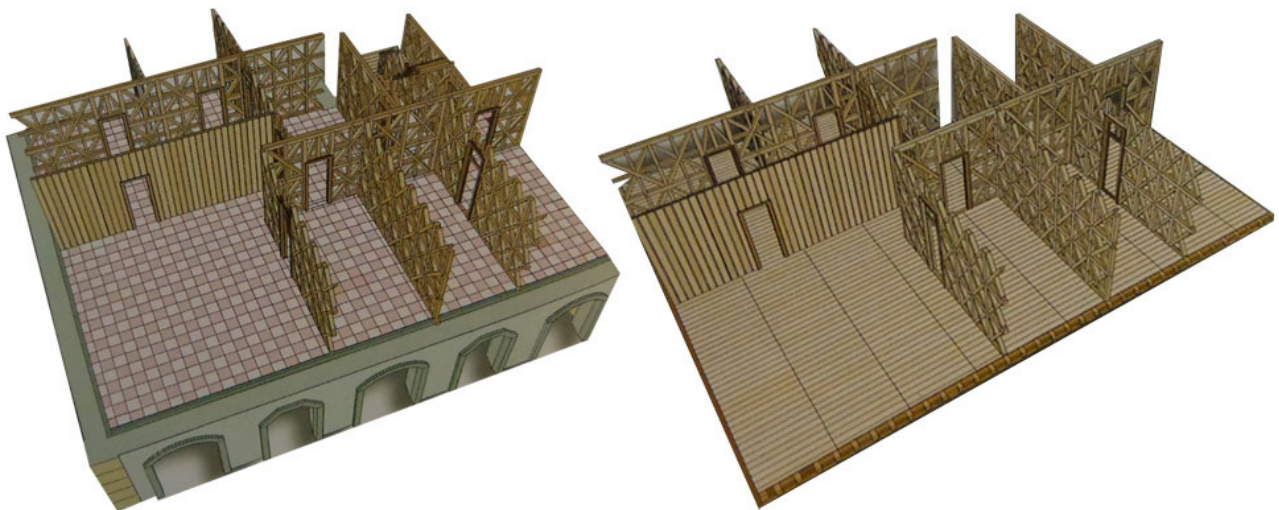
In Appleton J. Reabilitação de Edifícios. a) Example of the plan layout on the first floor. b) Example of a plan layout of the wood structure of the superior floors.
